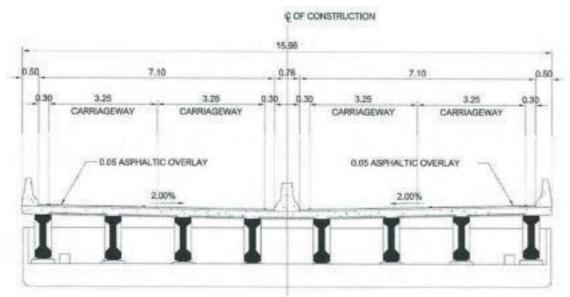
Typical roadway section of Links (Source: Technical Proposal of Italian-Thai Development Private Company Limited)
